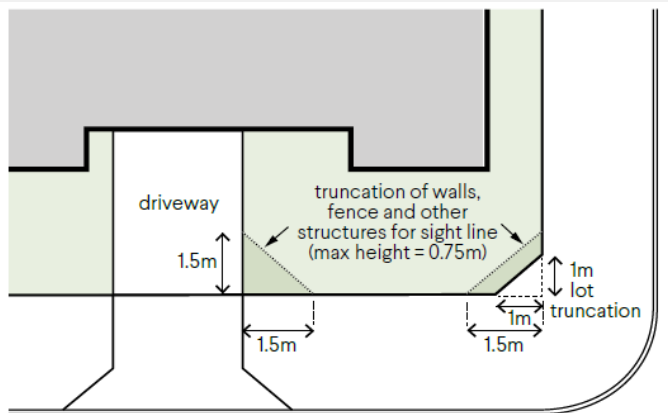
Truncation at street corner to provide sightlines (refer A3.8.7).
